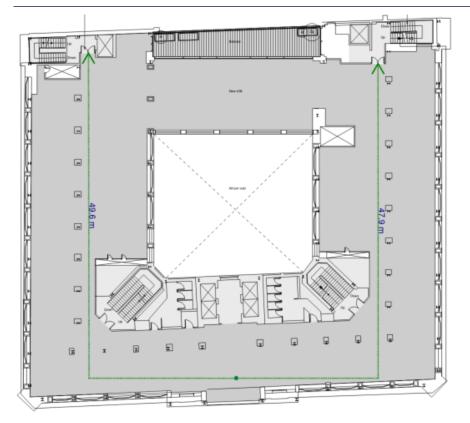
Travel Distances - Typical Upper Floor Level - final drawing still under development
